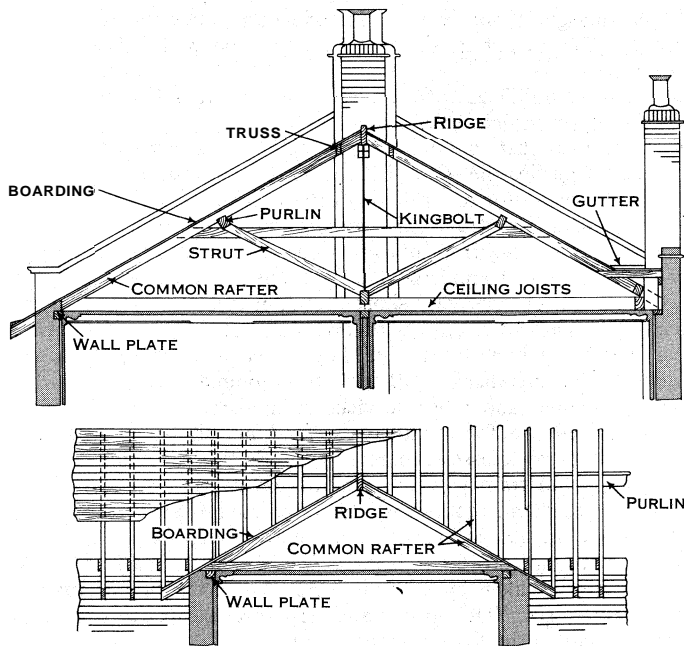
SECTION AND ELEVATION OF A ROOF FOR A DOMESTIC BUILDING
